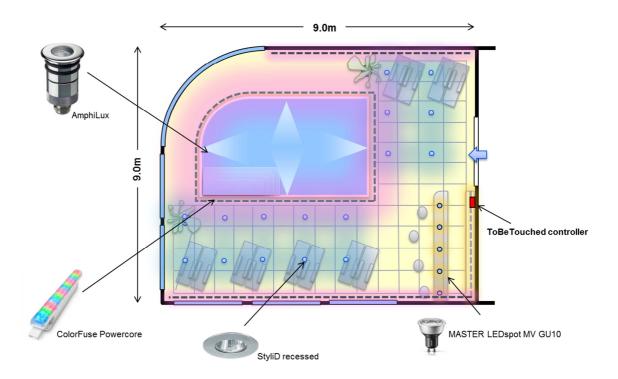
EXAMPLE OF LIGHT PLAN OF WELLNESS AREA
